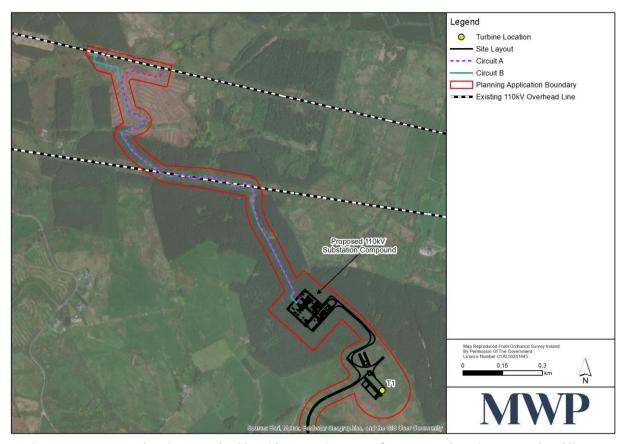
Proposed underground cable grid connection route from new substation to overhead line.
